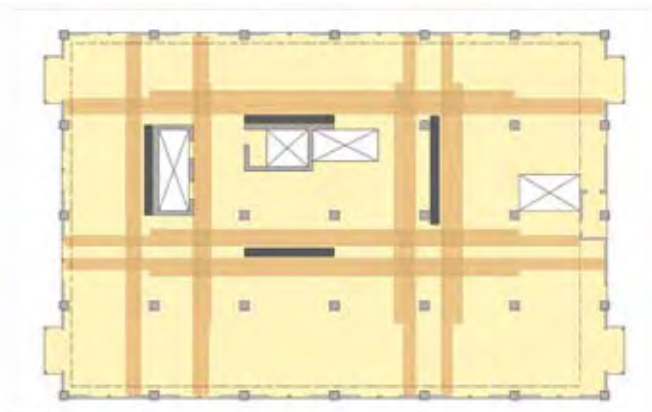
Floor plan of the retrofitted structure showing new shear-walls in black and new carbon fiber collector elements in tan
